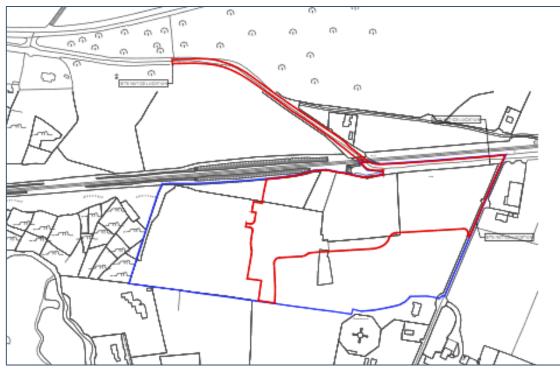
Redline Boundary Plan (Source: Extracted from Drawing No. 20175-3001)
